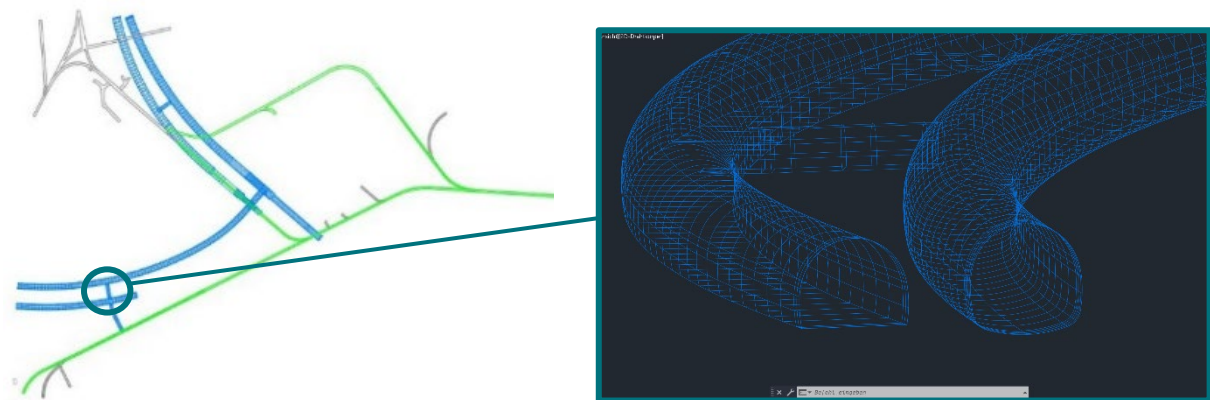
3D solid of the entire tunnel and gallery system (left, top view) with zoom to the cross-section of the idealized railway tunnels (right)
